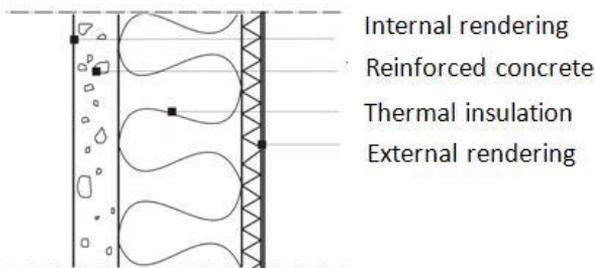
Insulated reinforced concrete wall with building board façade. Original structure and renovation alternatives with additional thermal insulation and replacing renovation.
